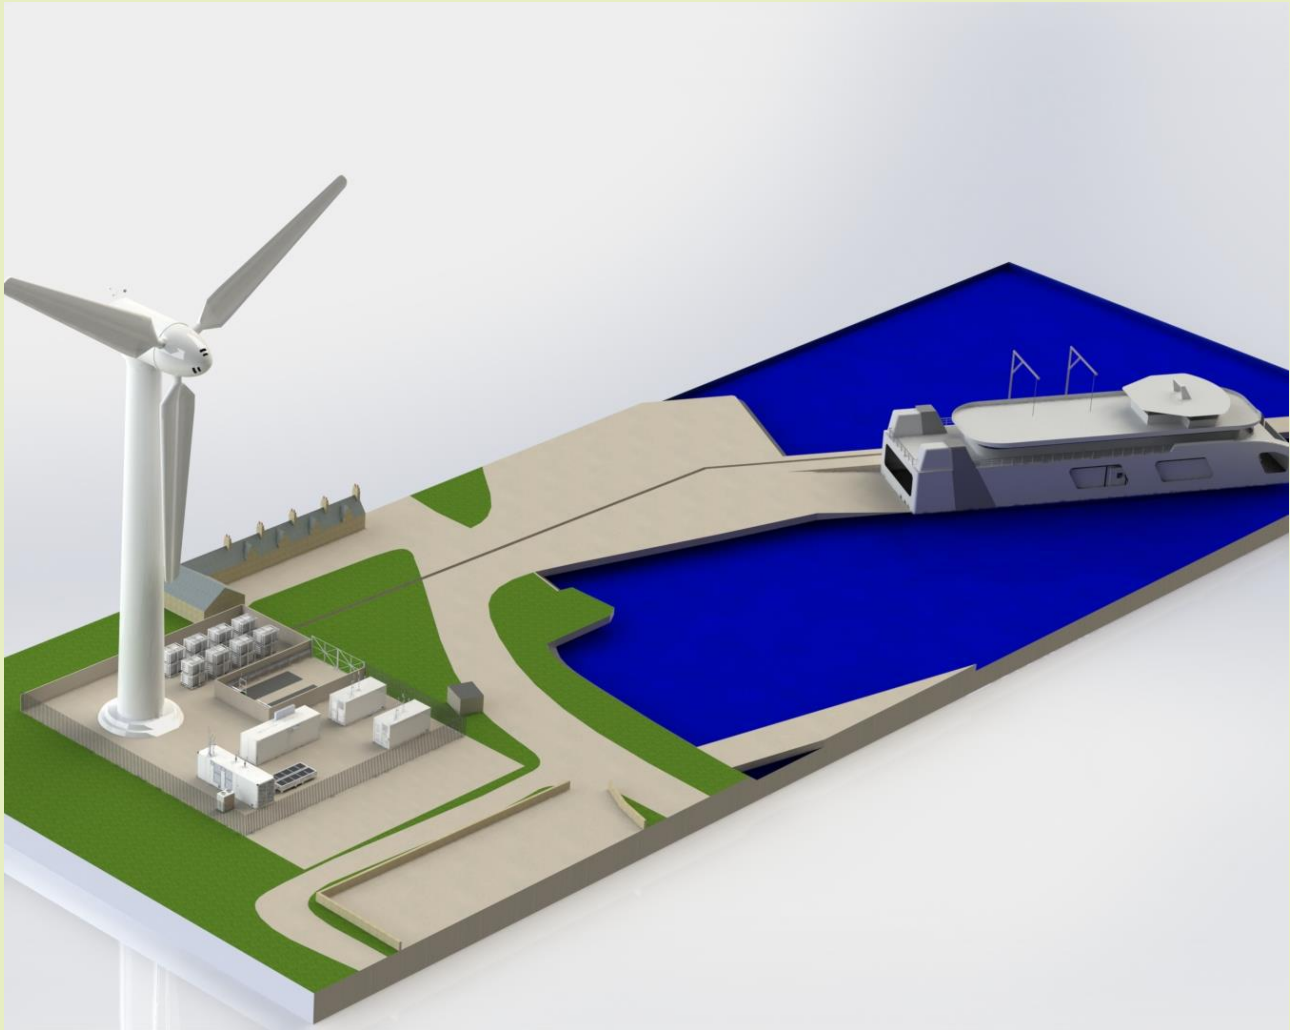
Example layout of the site containing the site for the hydrogen equipment, pipeline and dispensing equipment on the harbour.
